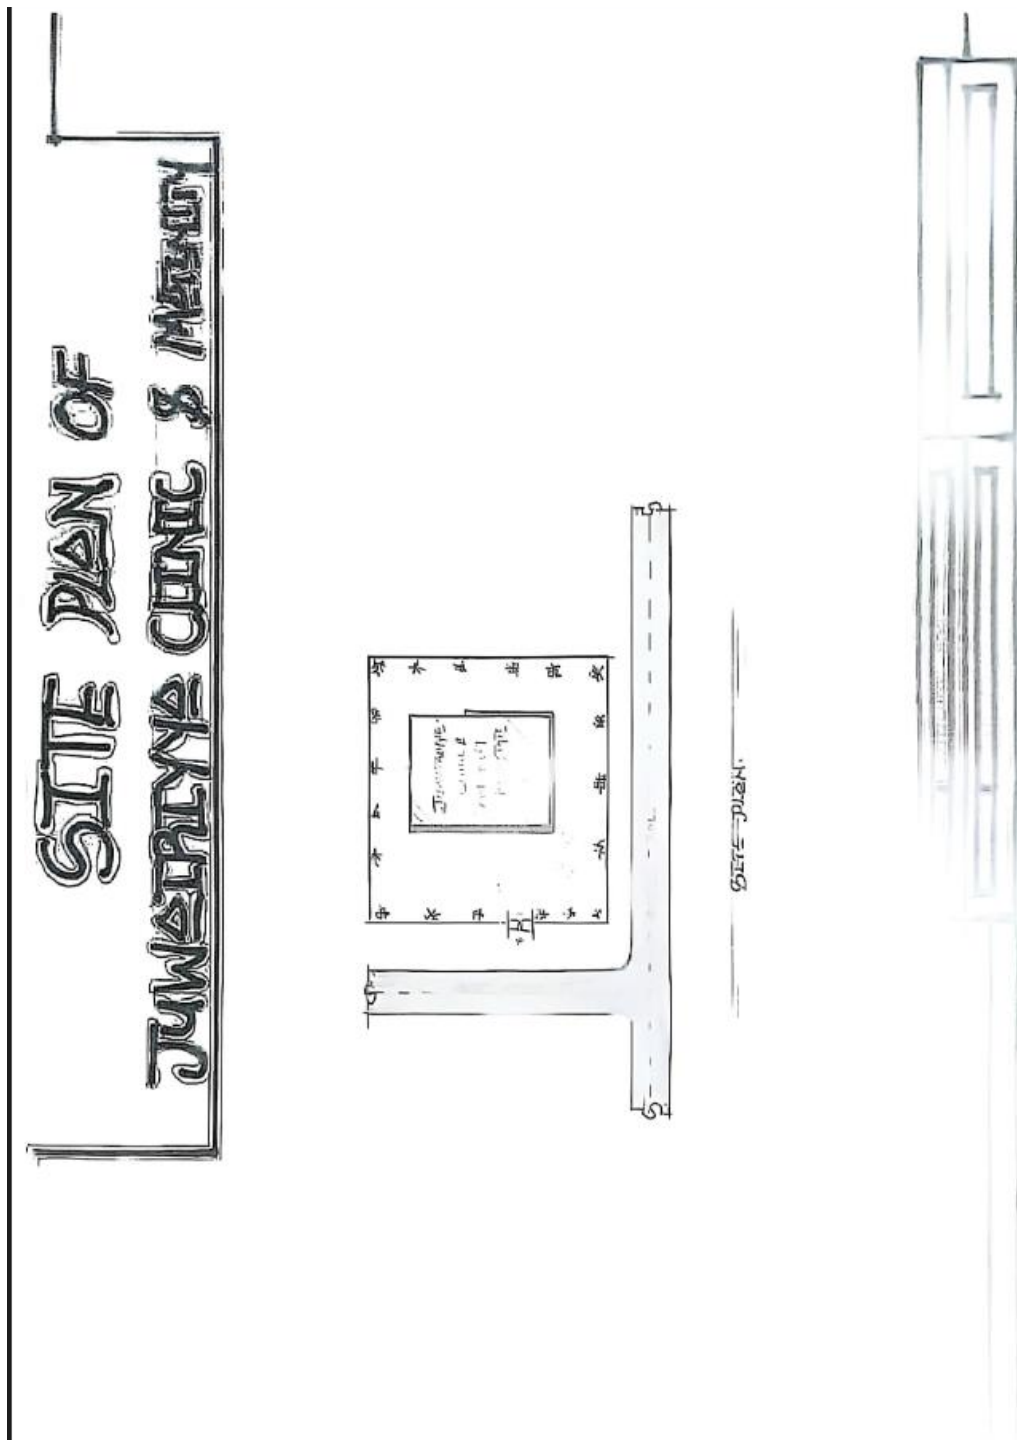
SITE PLAN OF CASE STUDY THREE
